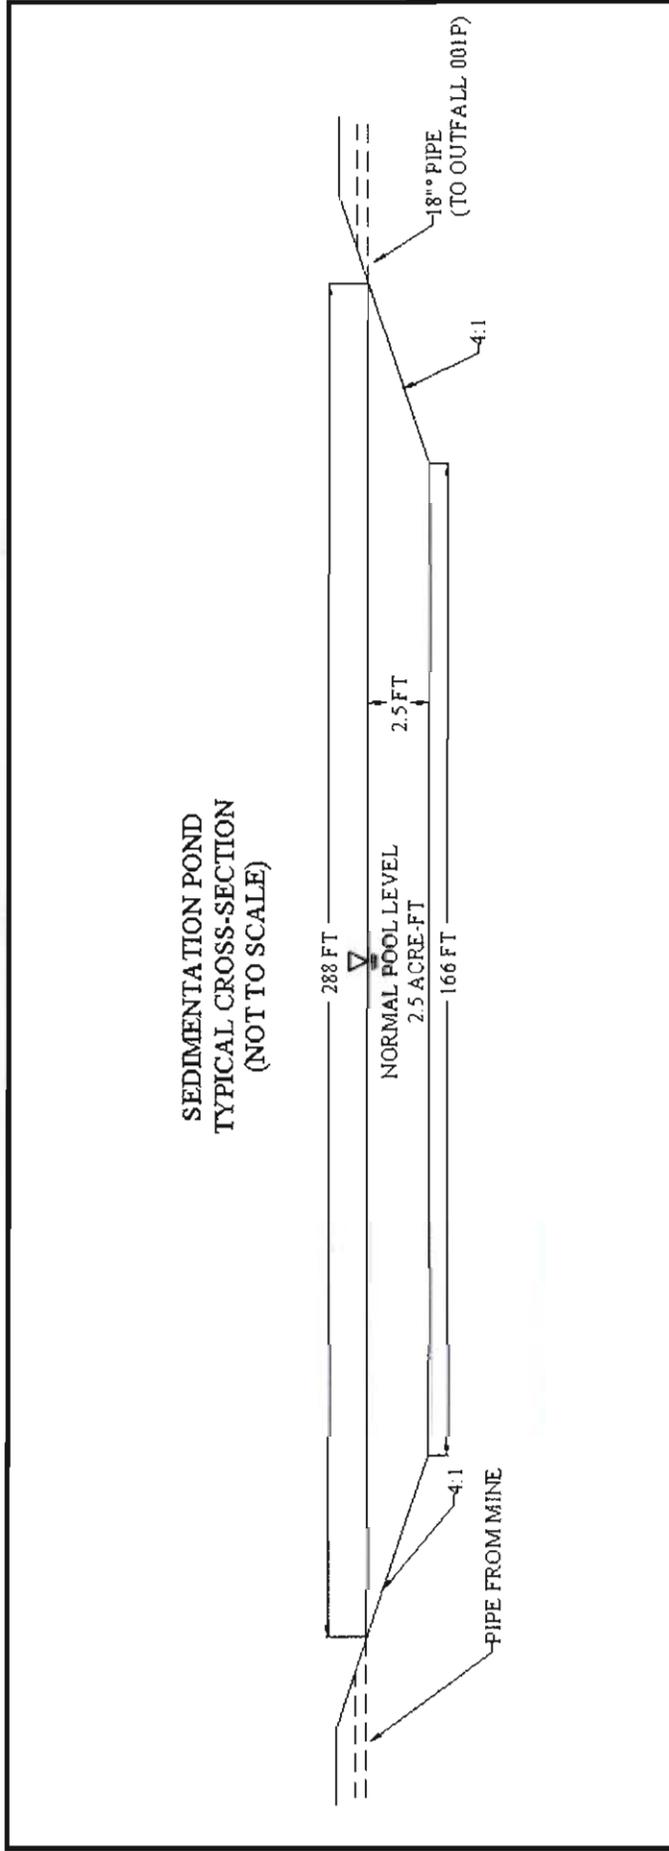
Proposed Sedimentation Pond Typical Cross Section
